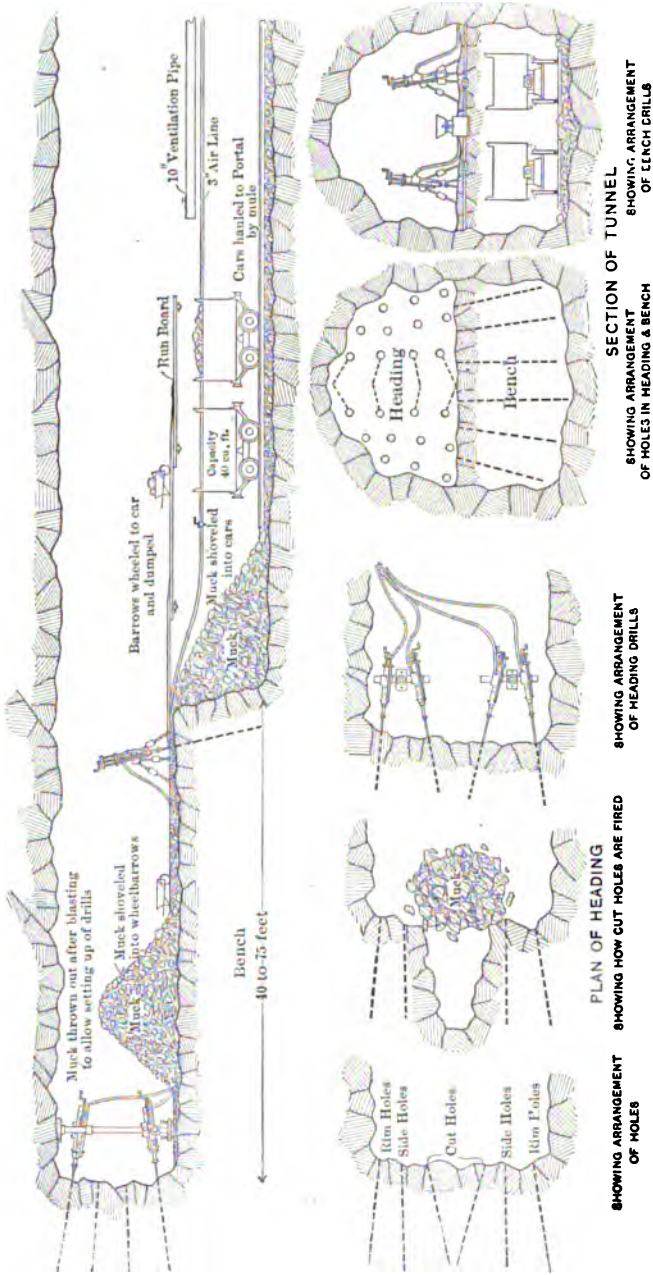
Diagrammatic Scheme of Excavating Bonticou Grade Tunnel, North Heading.
